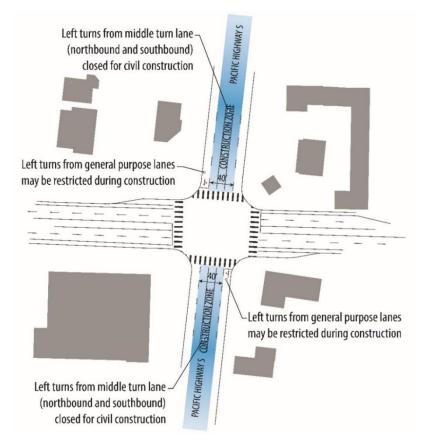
Construction of Elevated Guideway in Median (Typical Plan View)
